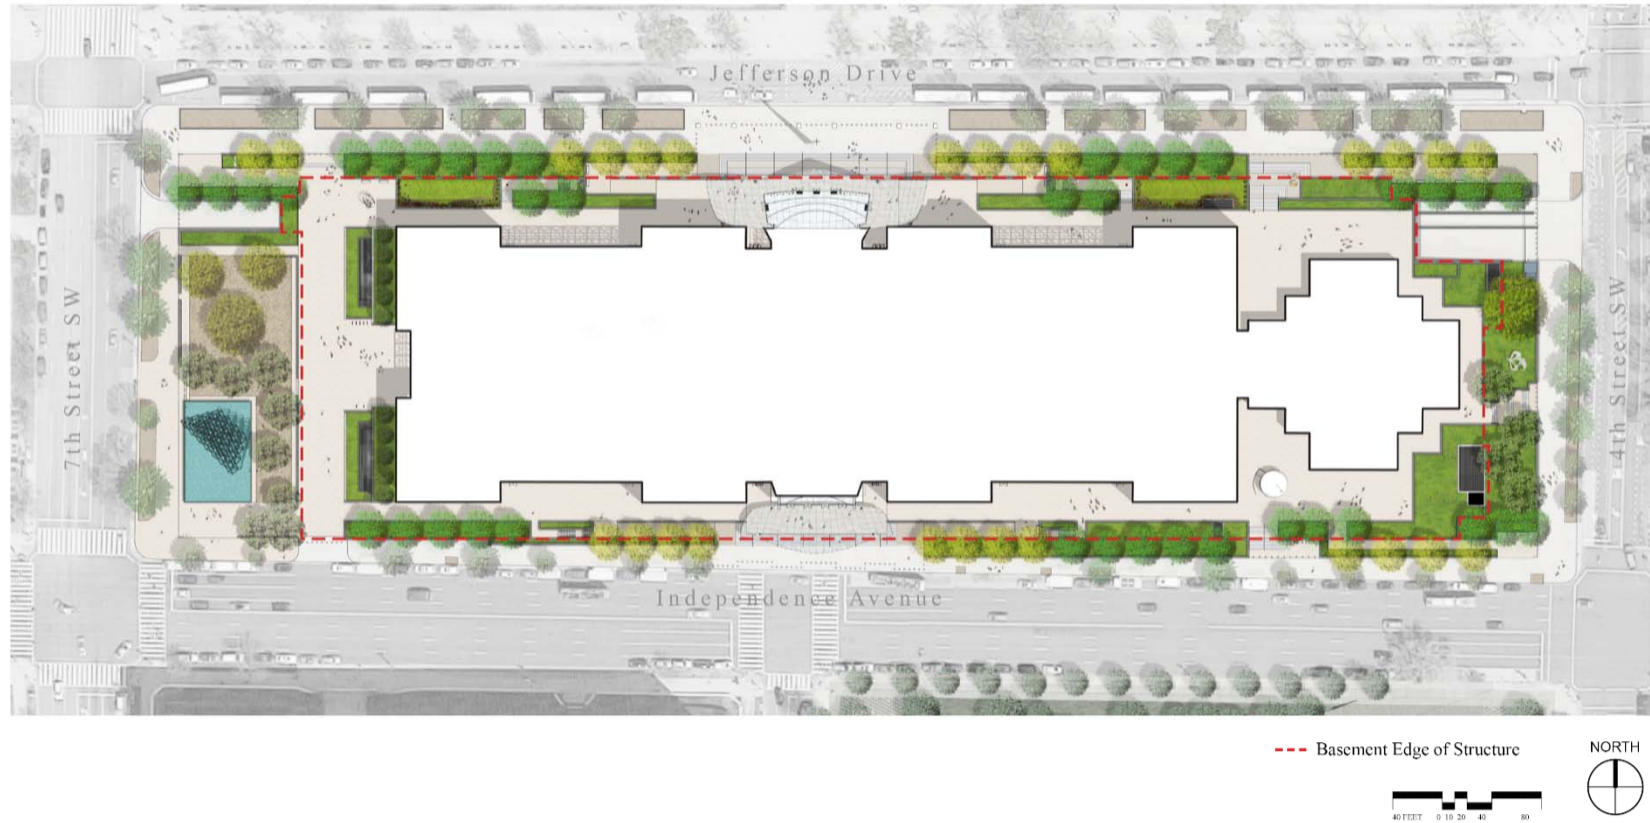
26: Proposed Site Plan. (Source: AECOM.)
